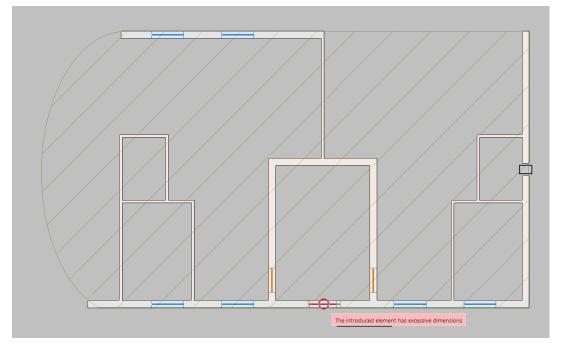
Plan view of the model converted in IFC Builder: The curtain wall, curved wall, and column have not been converted; the window is converted but it results in an error within the software, rendering it unusable.
